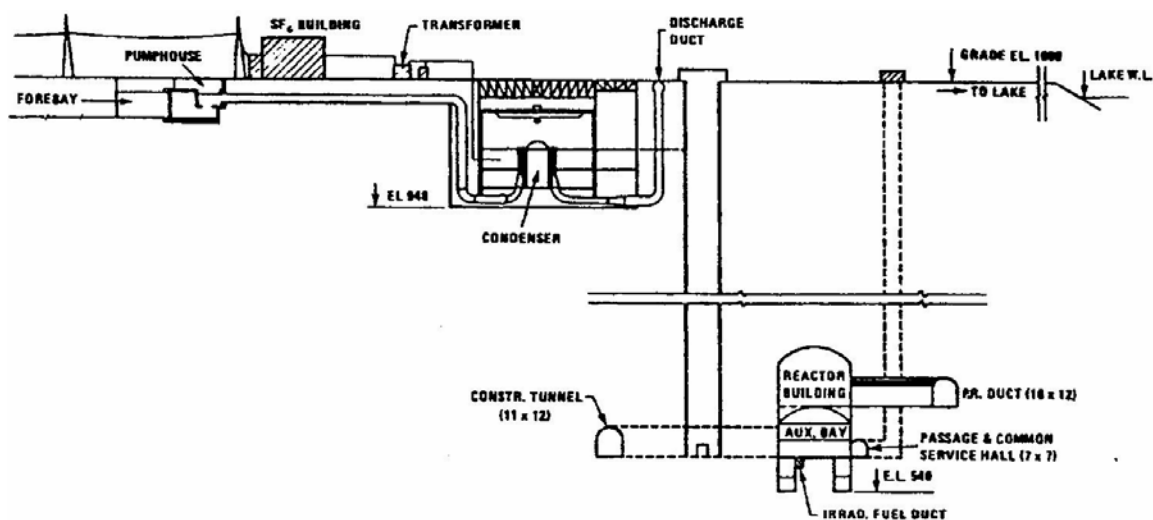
General cross section for an underground CANDU power plant (after Oberth, Lee, 1979).
